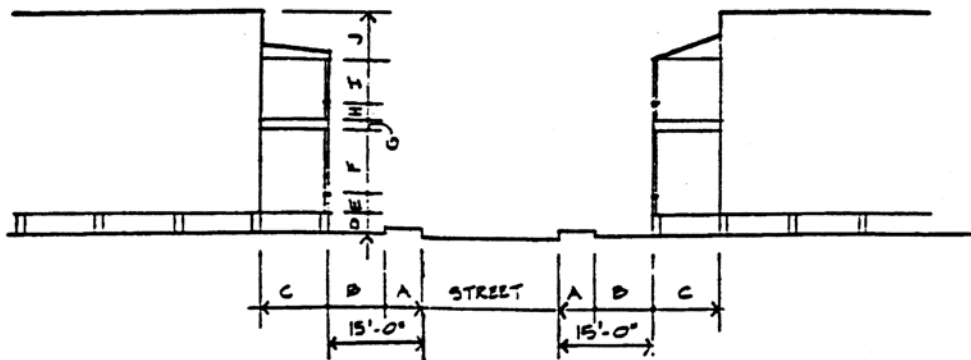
WOOD COTTAGES DISTRICT—Streetscape, Type 2
